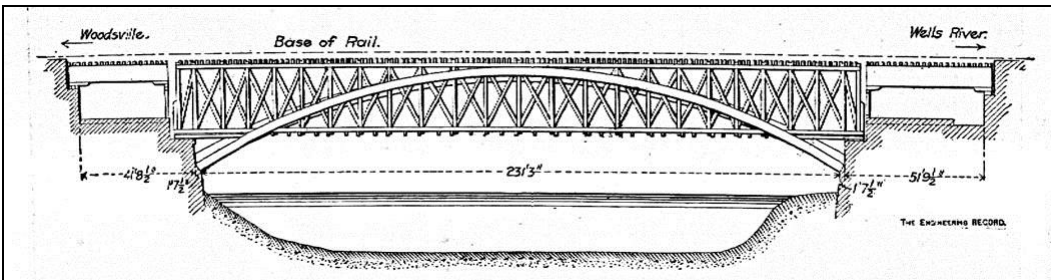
Concord and Montreal Railroad double-deck bridge, railroad over highway, built 1853, called longest single span bridge in the US at the time (*Engineering Record*, 1904).
